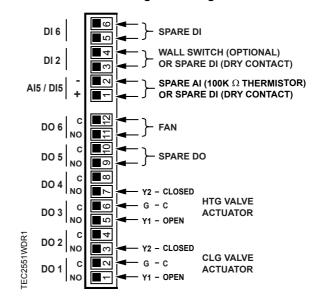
Application 2551 — Fan Coil Unit Cooling and Heating.
